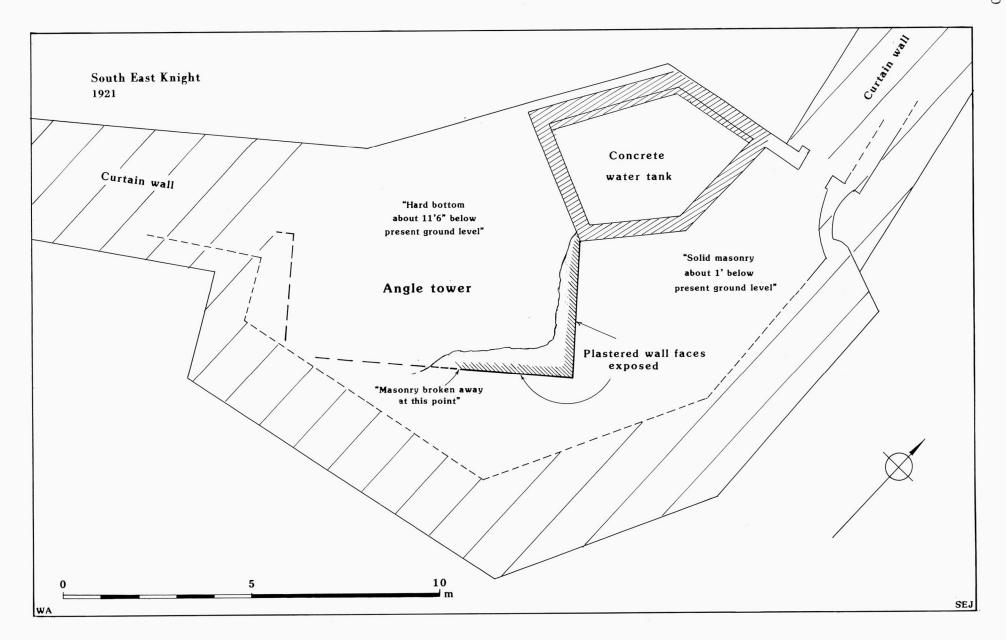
Plan of the south-east Knight (Mountjoy Tower)
